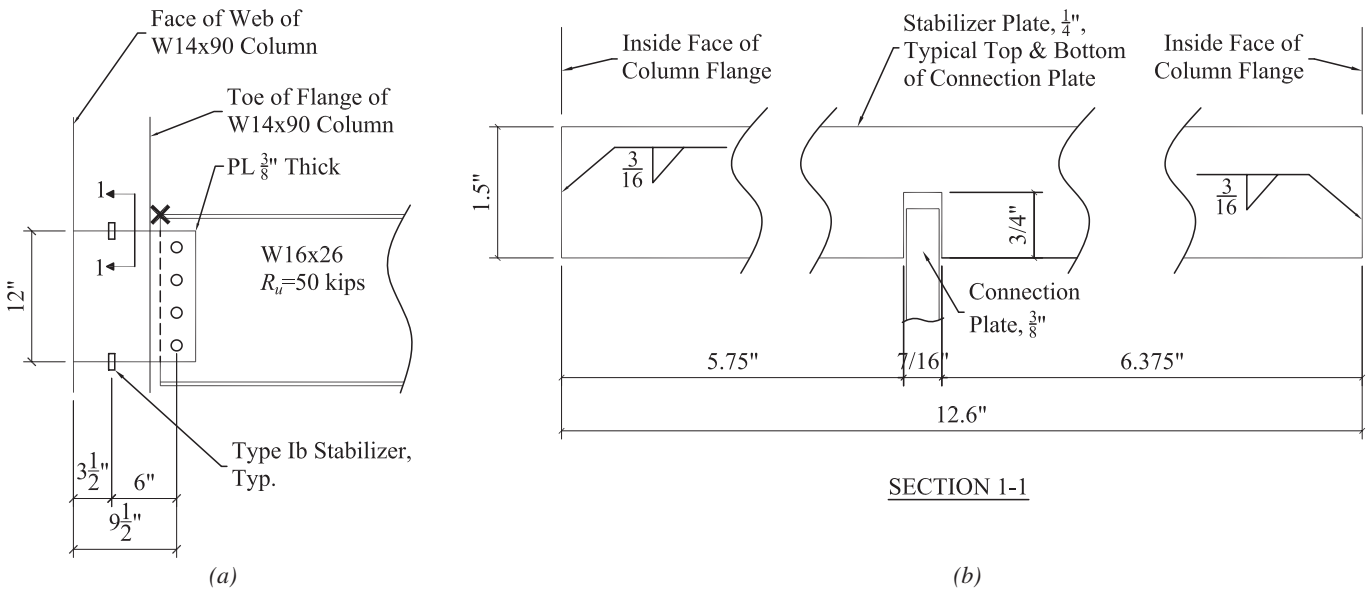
Connection and details for Example Problem 2: (a) elevation; (b) final details of stabilizer plate.
